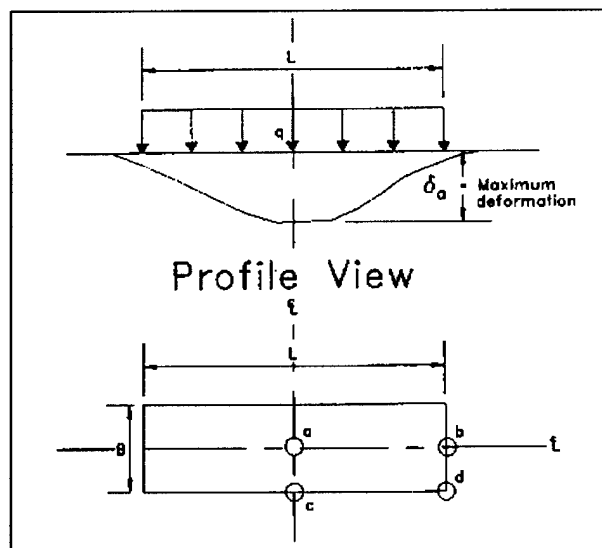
Typical deformation profile under a uniformly loaded, rectangular shaped, flexible foundation
